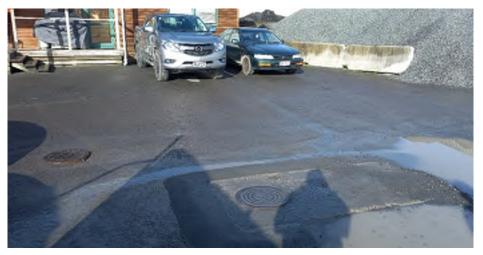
Site office and carpark area located in beside the eastern site boundary towards the middle of the site.
